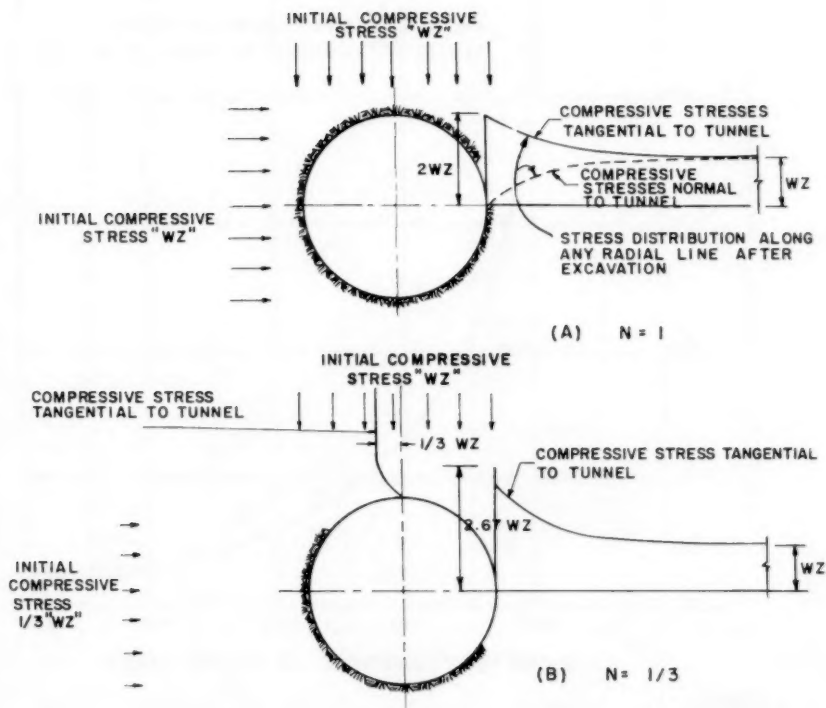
ROCK STRESSES AFTER EXCAVATION
